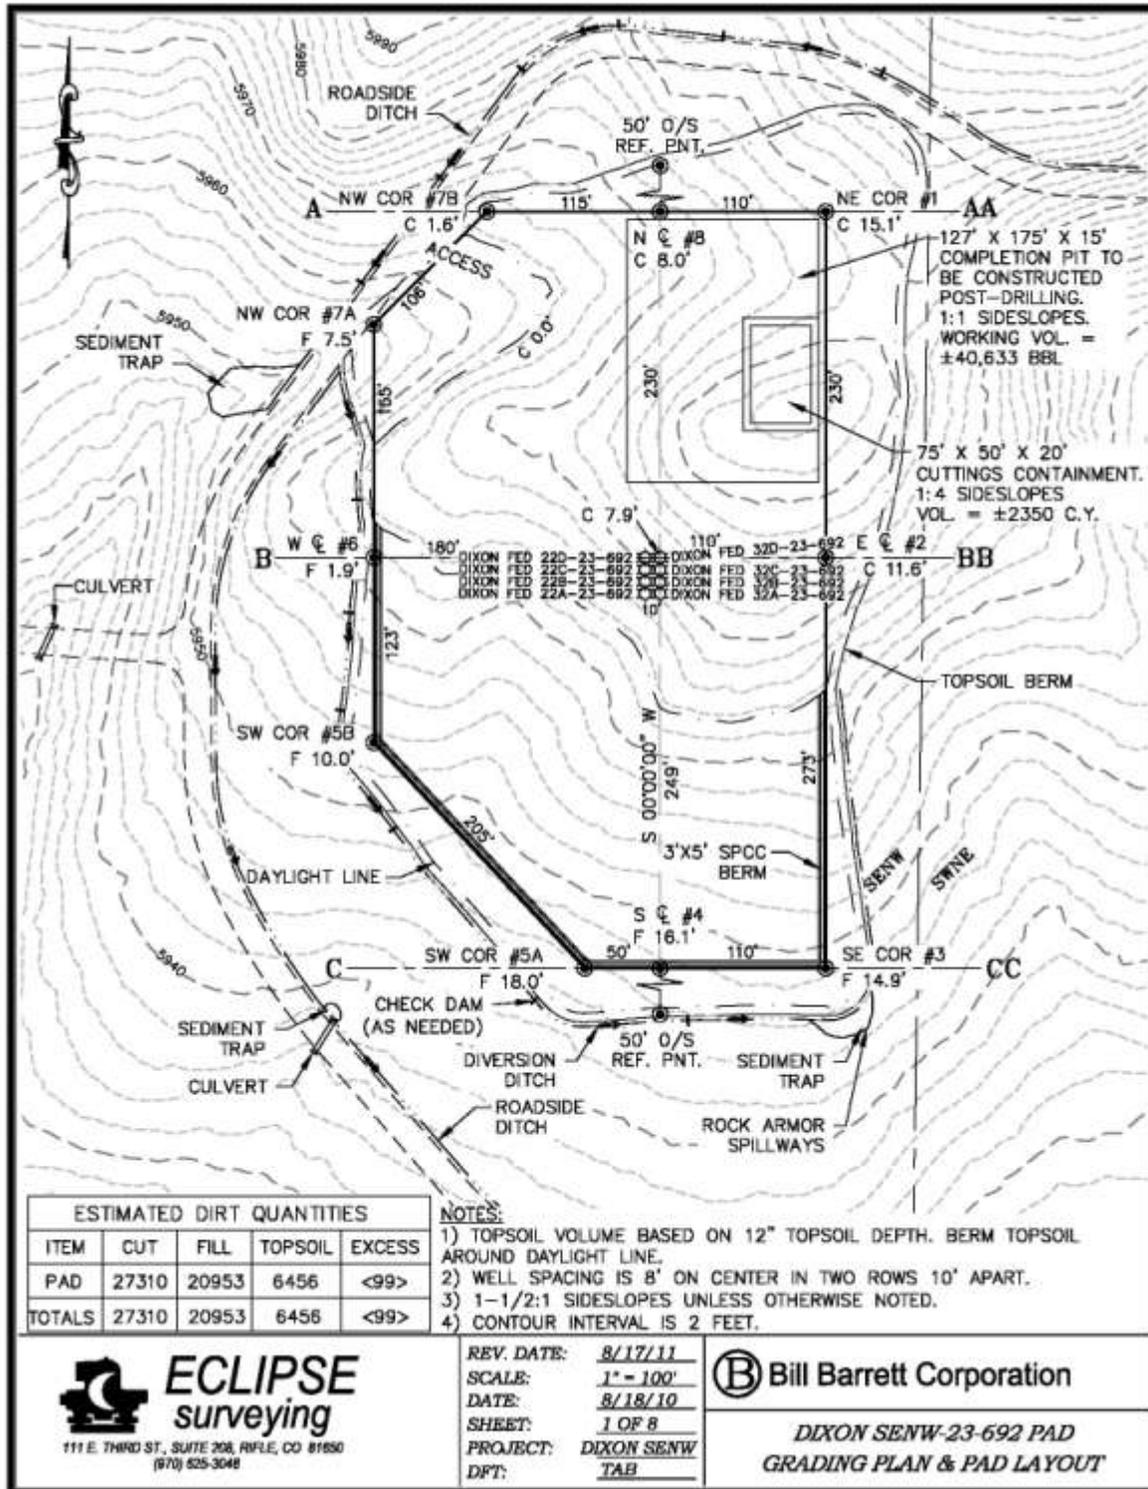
Dixon SENW-23-692 Pad Construction Layout (Private Surface).
